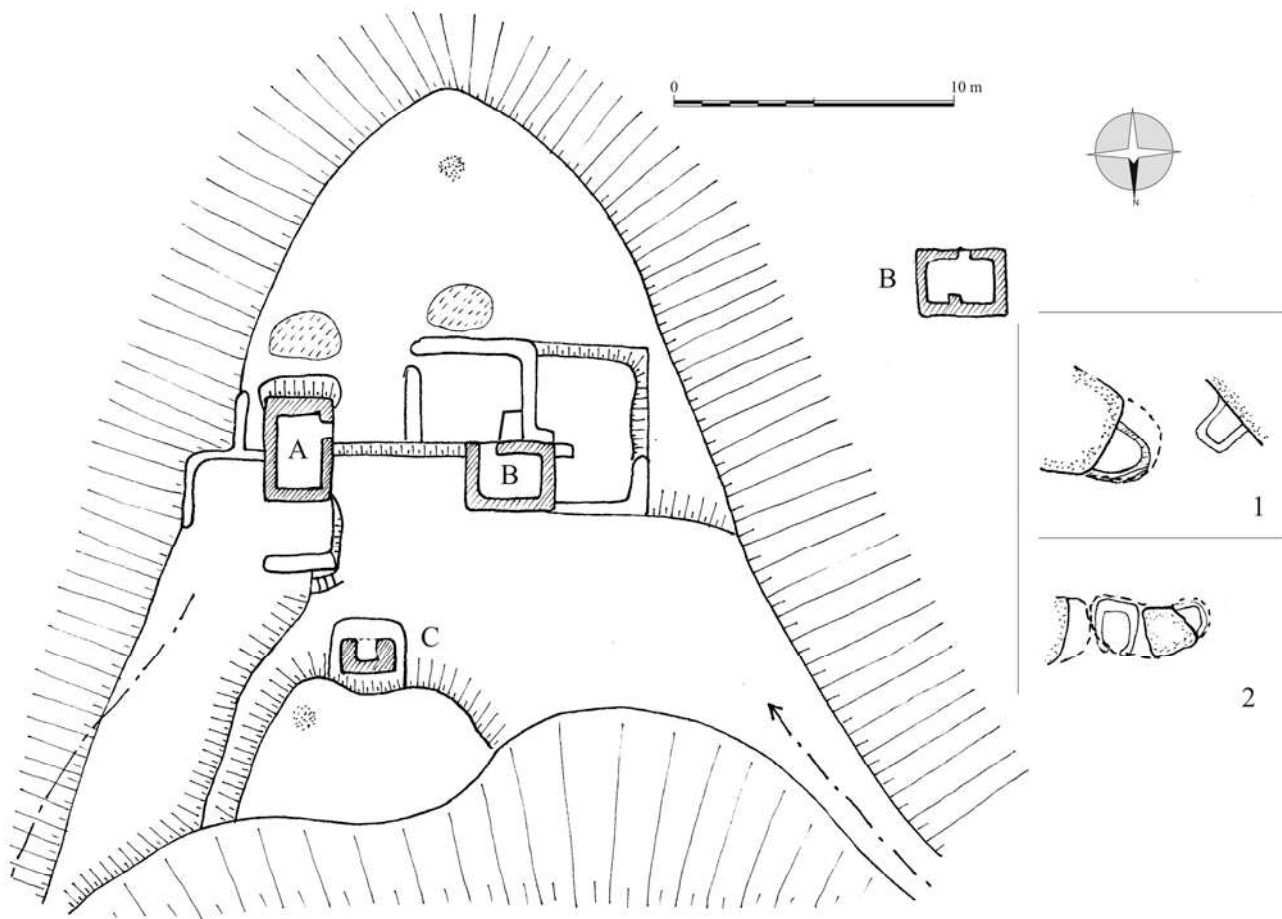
Documented occasional buildings on the way over Indrahar Jot pass. Main plan site below Triund saddle with two sleeping houses (A and B) and Shiva's temple (C). Dotted - external fireplaces, striped - dung hills. 1 - small occasionally living place under stone abri with small storage building near Triund. 2 - similar feature on the northern side of Indrahar Jot pass.
